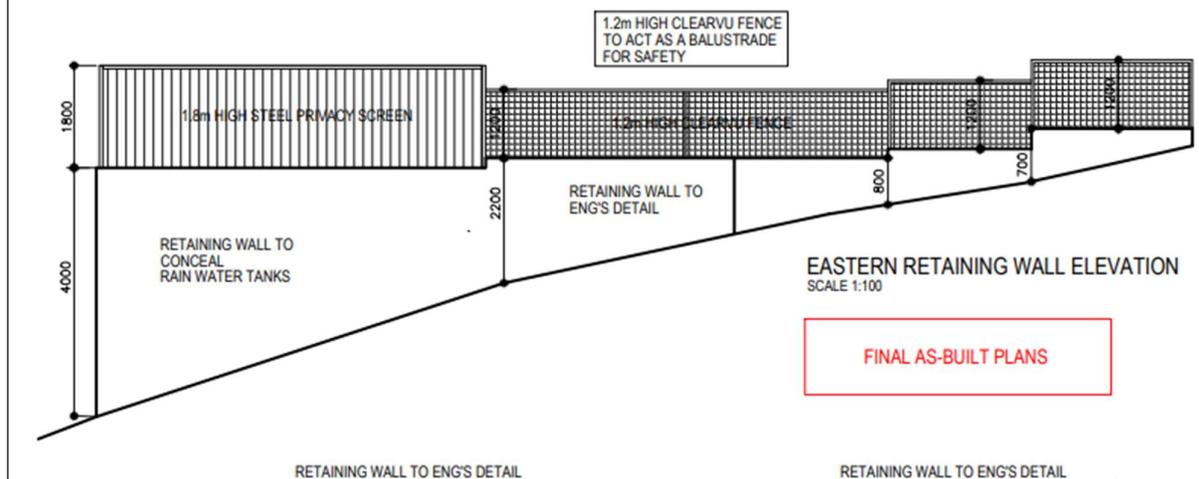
Picture illustrating the retaining wall and screening on the Eastern side boundary as seen from Dr. Ross's property.
